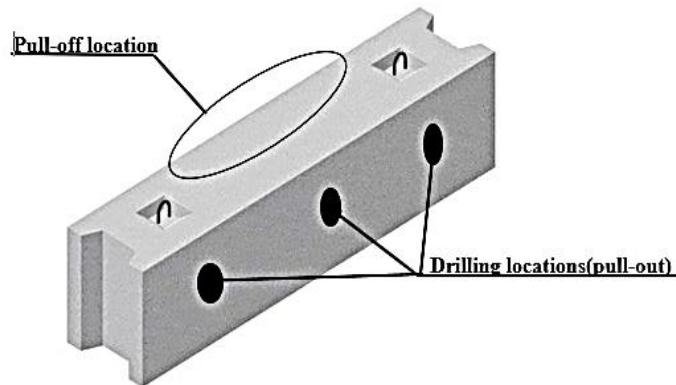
Prototype (foundation structure, tested in situ/laboratory)
